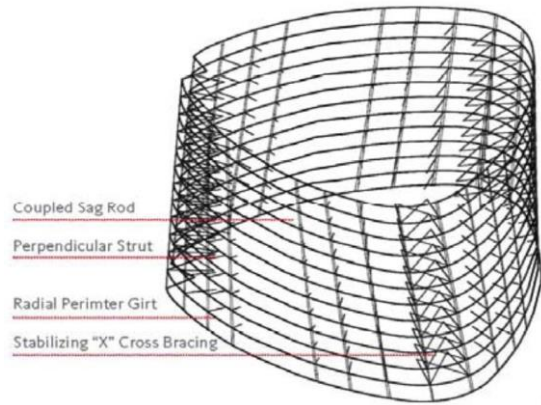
CWSS (Shanghai Tower Façade Design Process, 2010)
